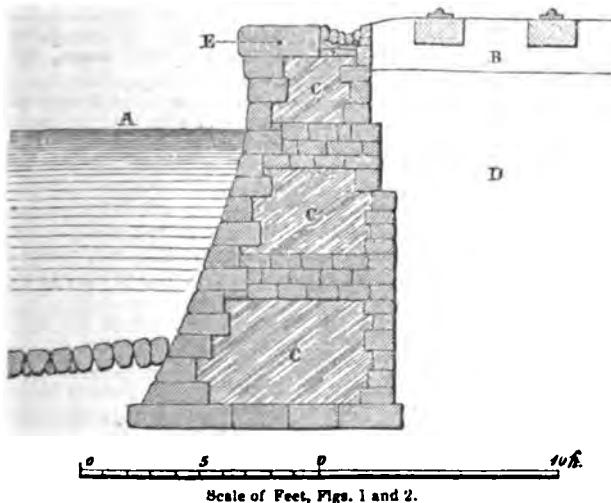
Edinburgh and Dalkeith Railway, Leith Branch. Section of the Sea Wall as executed in 1837.—A, Level of High Water Spring Tides; B, Ballast; C, C, Concrete; D, Sand; E, Dowel.
